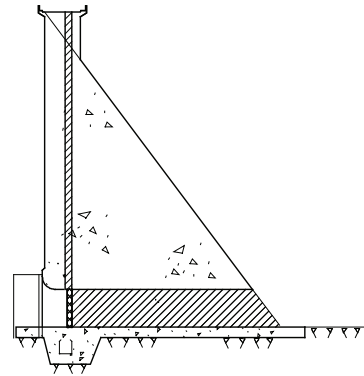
Longitudinal section of a sluiceway in a concrete gravity dam.
